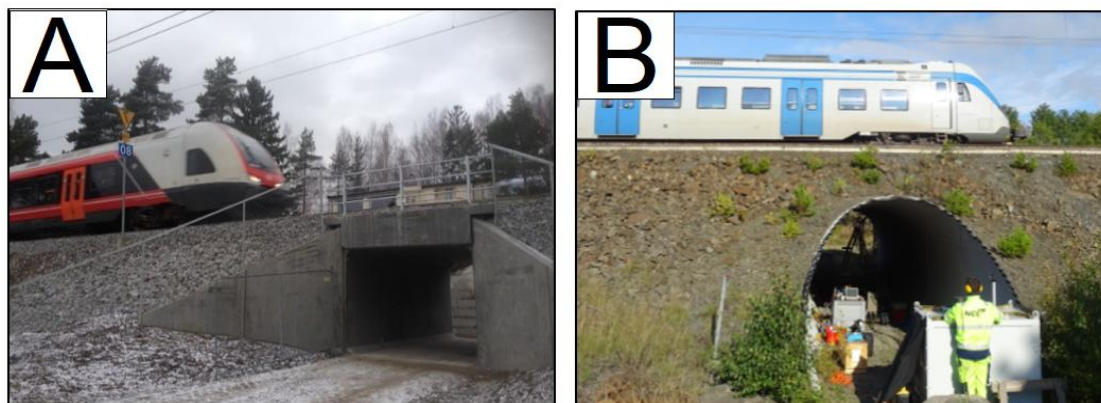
Illustration of a train passage over A) a rigid concrete bearing culvert from Norway and B) a flexible steel-soil composite culvert from Sweden (Source: <http://www.oatek.no/> and via Andreas Andersson)
